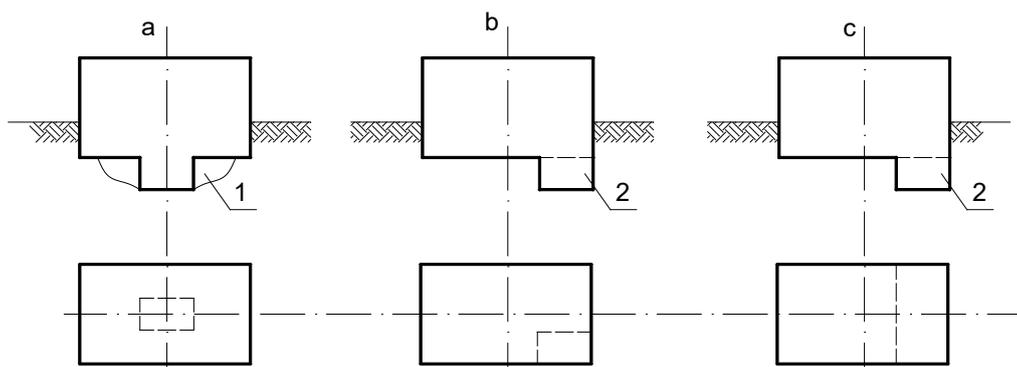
Examples of variants for shaping the foundations of buildings at different depth levels: a – central recess, b and c – asymmetrical recess of the building section; 1 – compacted sand or lean concrete, 2 – horizontal expansion joint with slip layer [11], [12]
